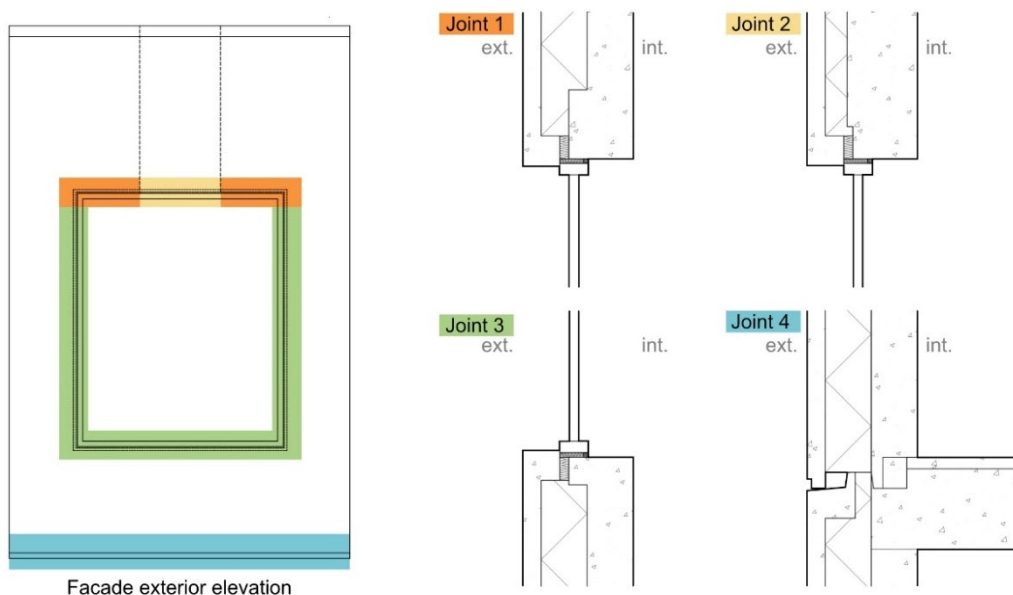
The insulated concrete sandwich panel's joints shown on facade elevation and its detail.
